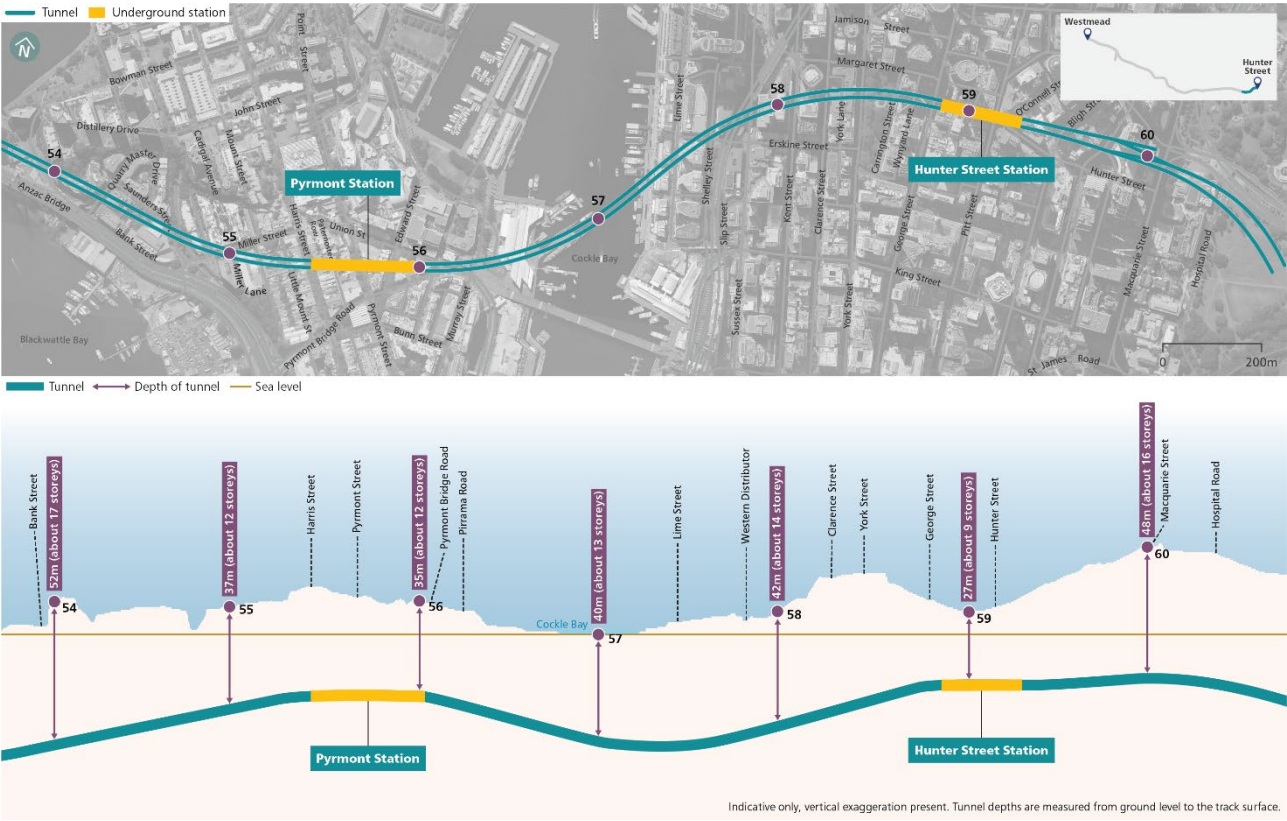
Indicative alignment plan and long section (8 of 8)
